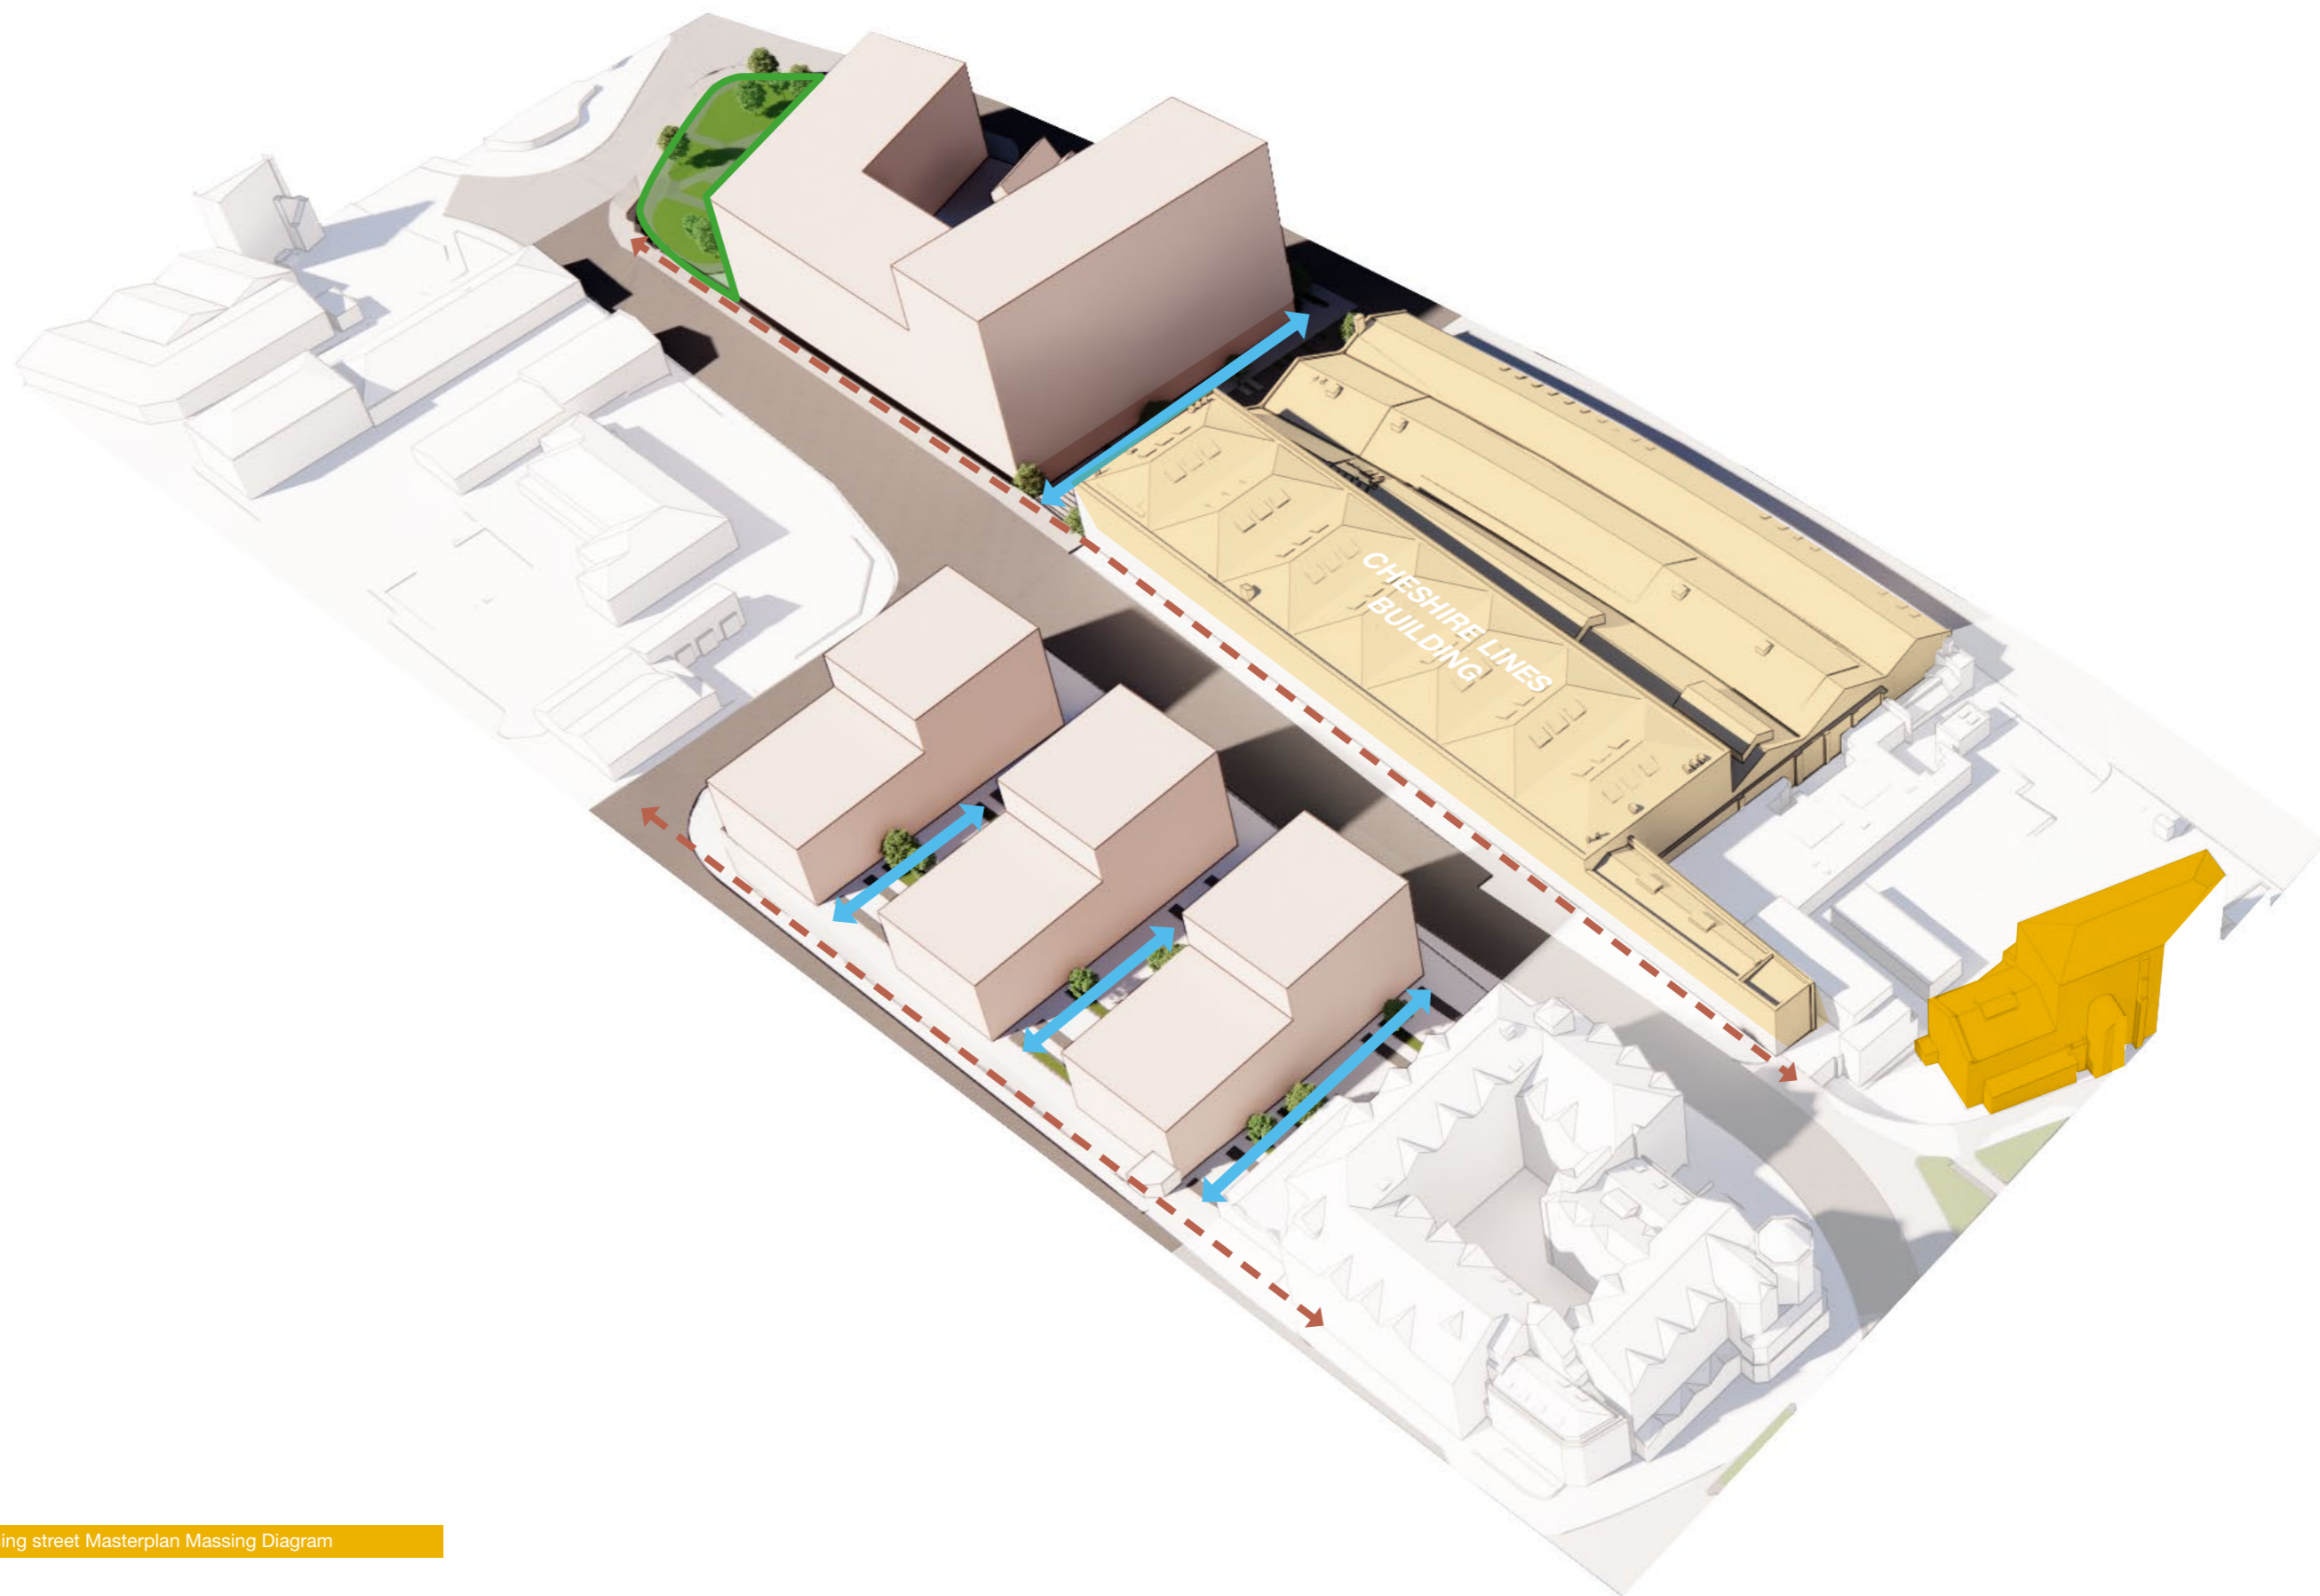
Canning street Masterplan Massing Diagram
